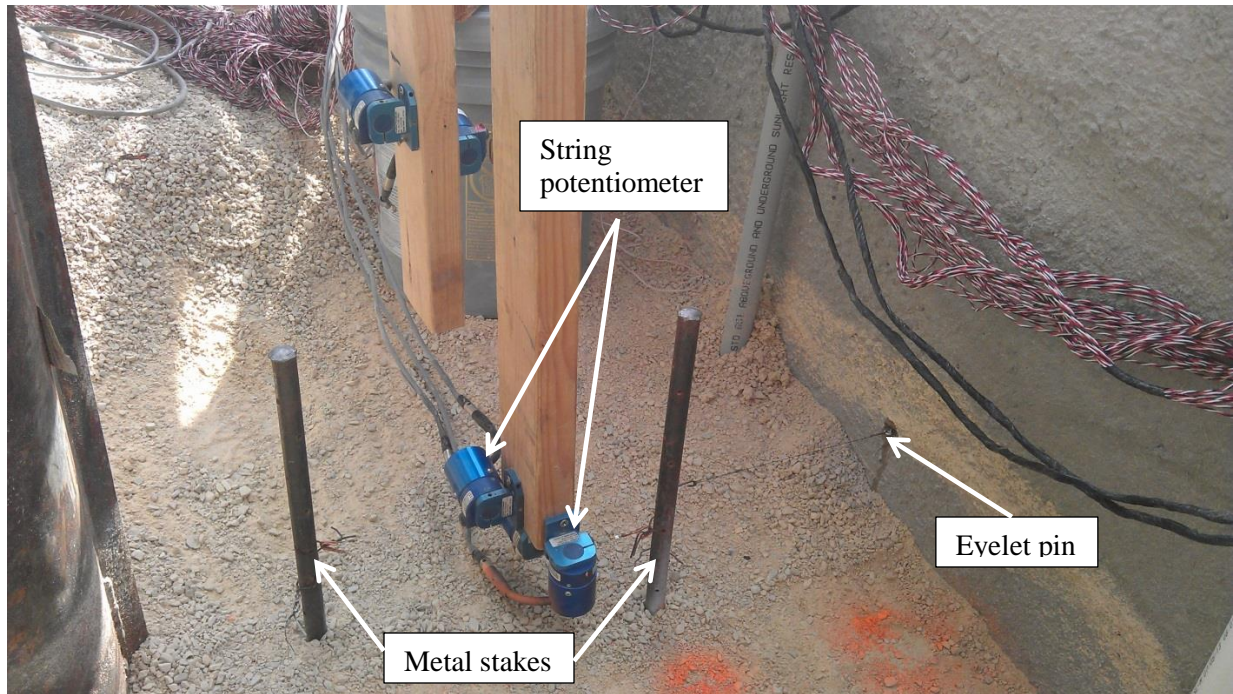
Typical string potentiometer setup for measuring ground and wall displacement.
